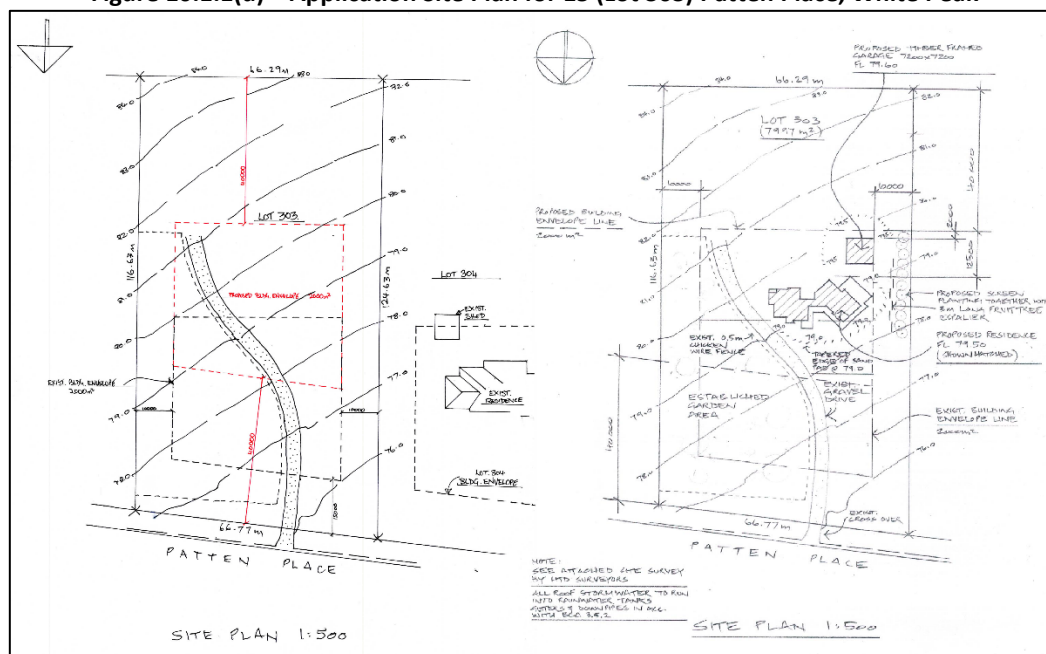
(d) – Application Site Plan for 15 (Lot 303) Patten Place, White Peak
